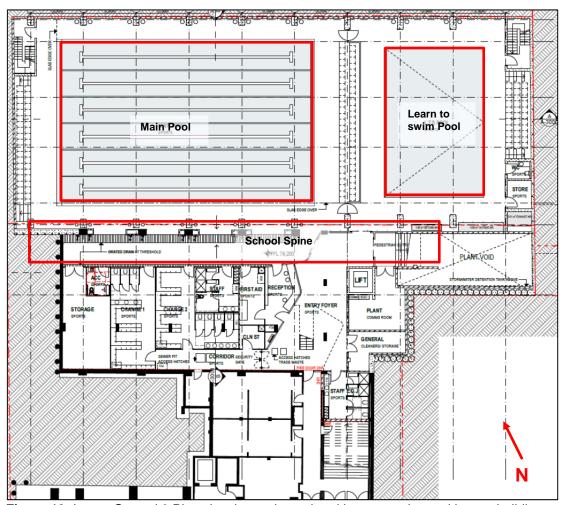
Lower Ground 2 Plan showing main pool and learn to swim pool in new building (Source: EIS)
